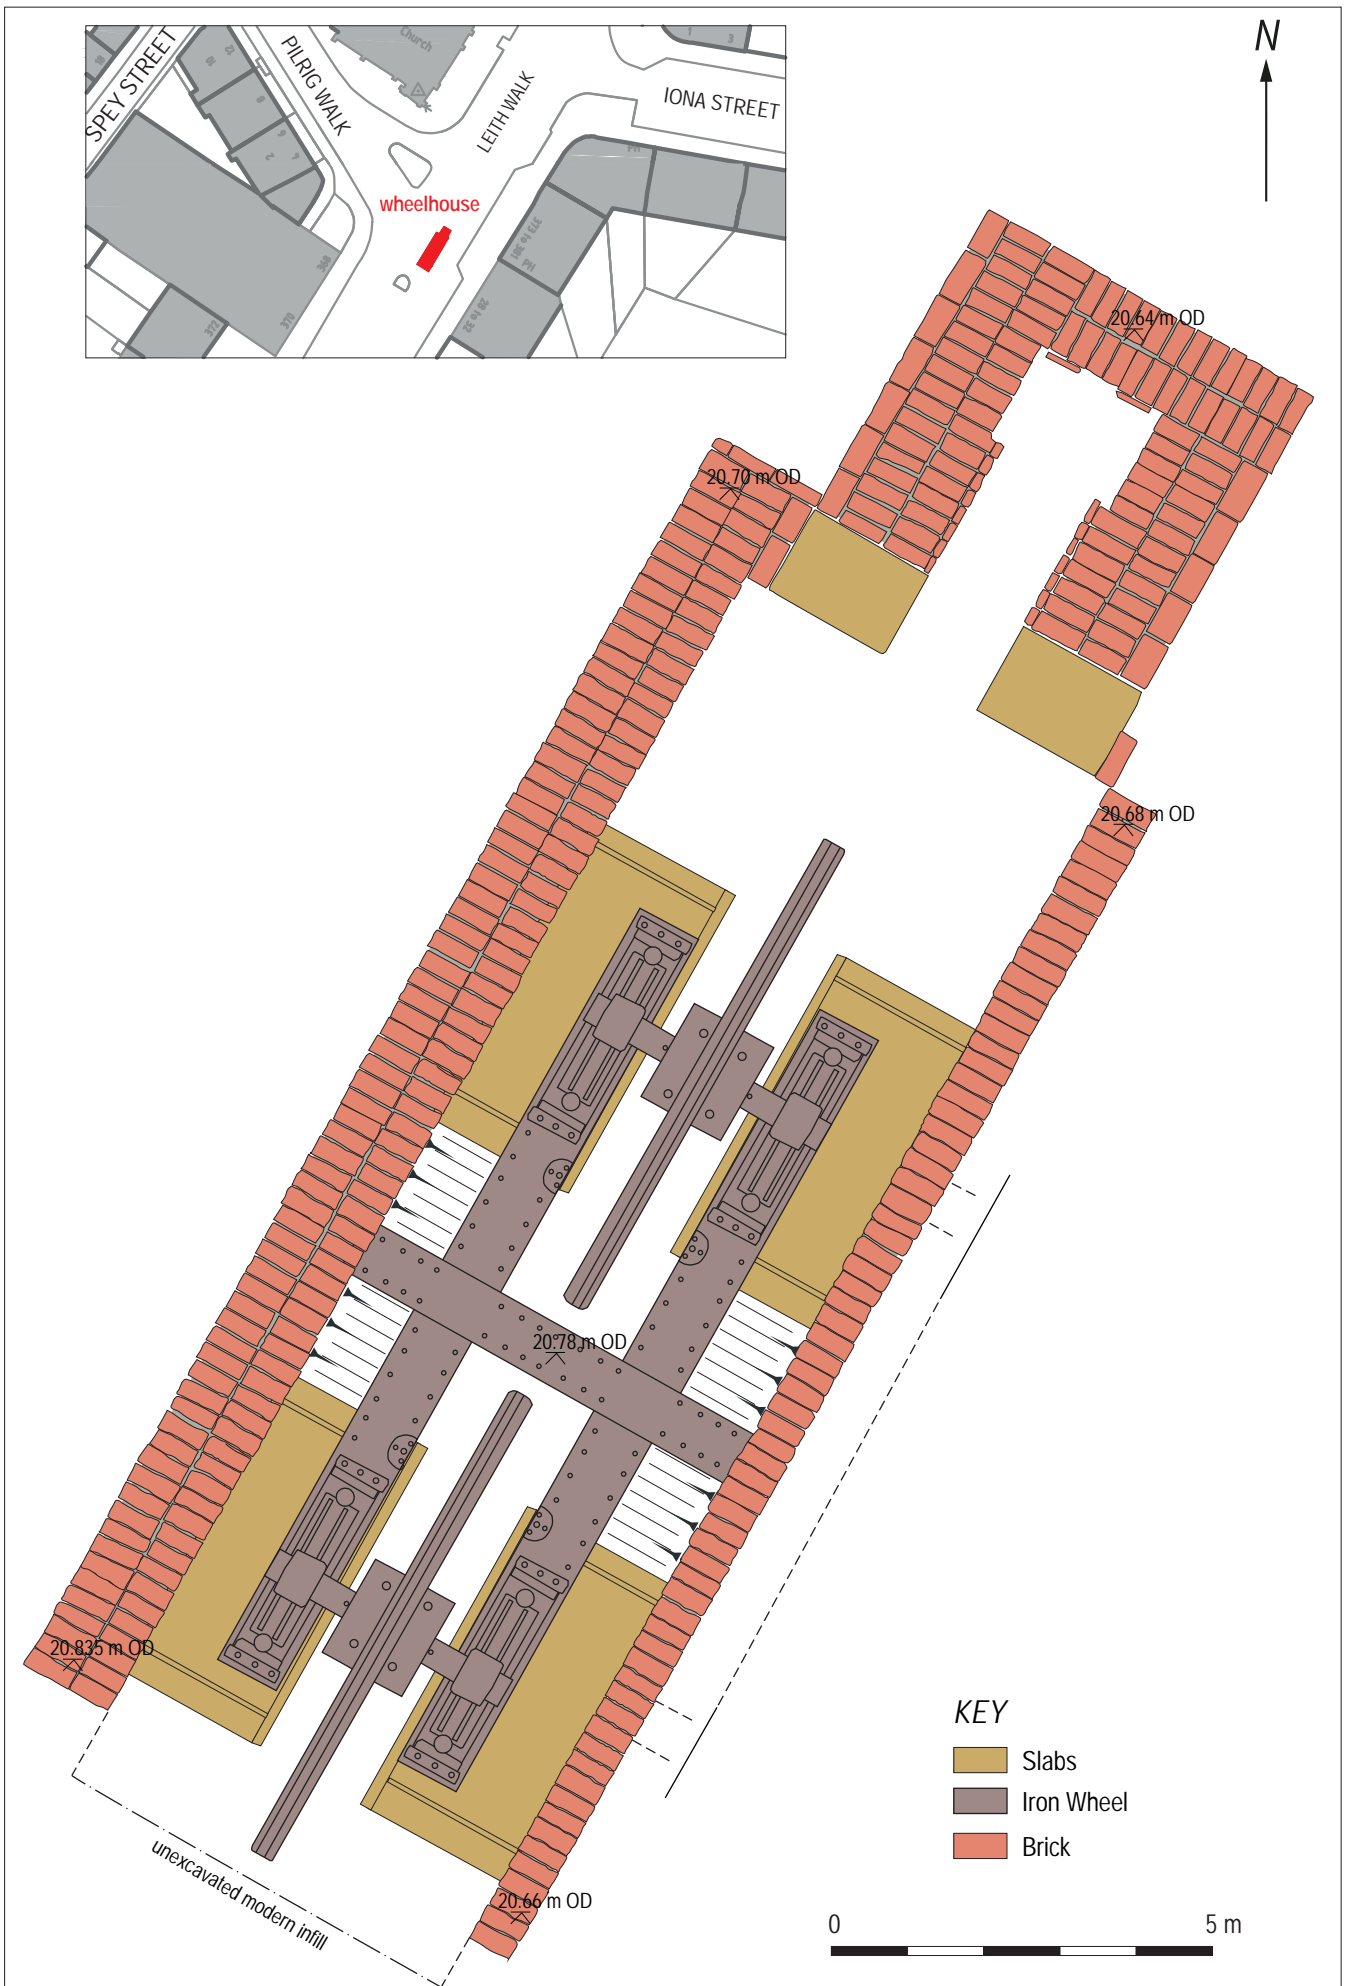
Plan of the early Tram wheelhouse at Pilrig Street.
